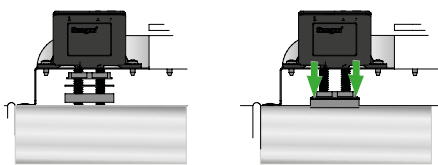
Tighten the counter nut against the tubular damper casing so that it presses the seal against the tubular damper casing.
